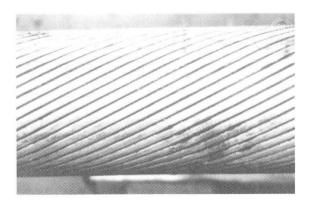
Spiral rope with a wide circular slot between cable and socket to prevent fretting corrosion.
